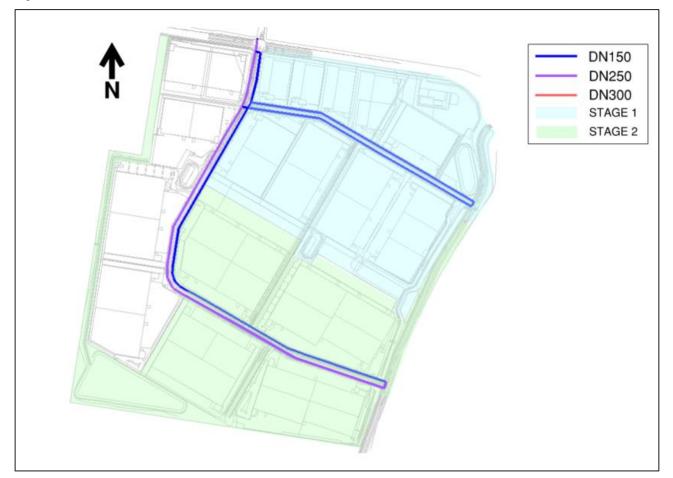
Concept Stage 1-2 Internal Water Network Layout
